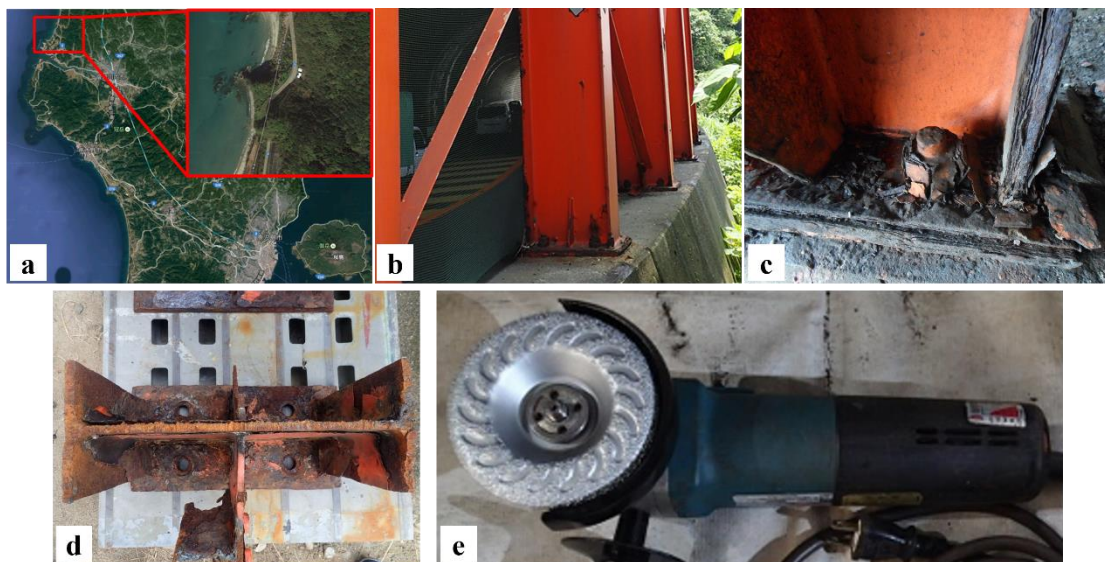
Location and surface conditions of severely corroded steel member: (a) Location of rock shed, (b) corroded columns of rock shed, (c) foot of corroded columns, (d) surface treatment target, and (e) used power tools with diamond grinding disc.
